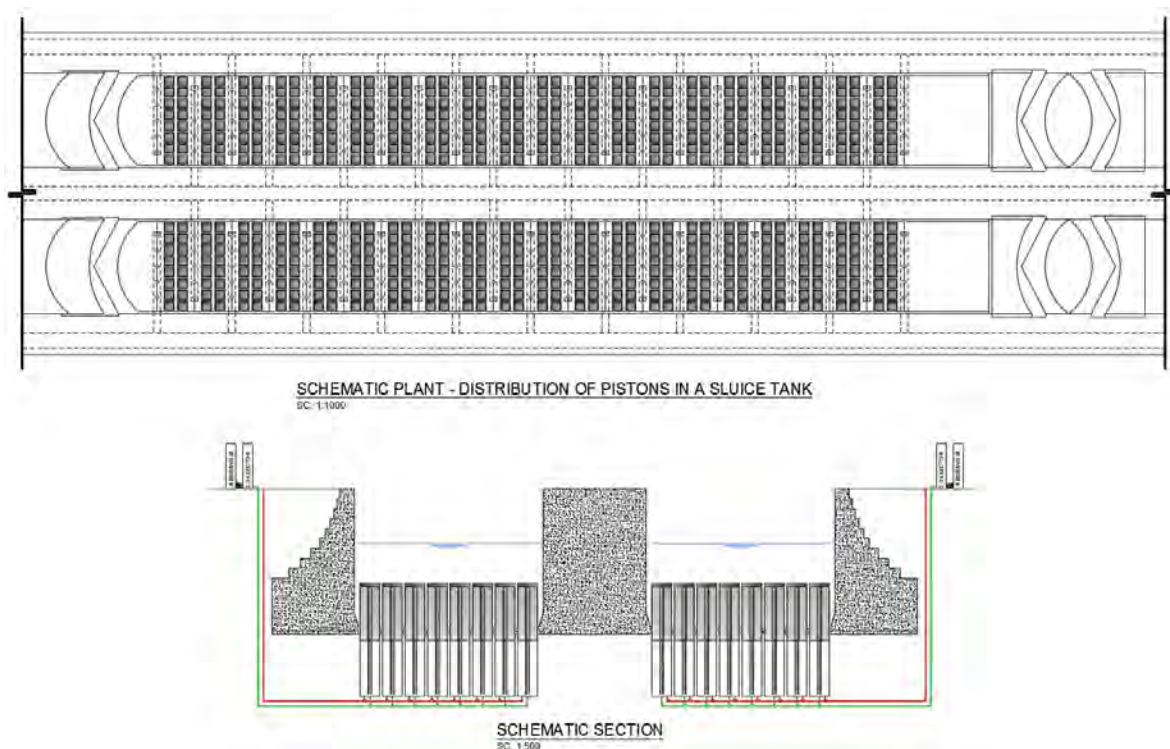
Plan View of Complete Installation at Panamax Locks (40% of floor area results in 40% water savings)
